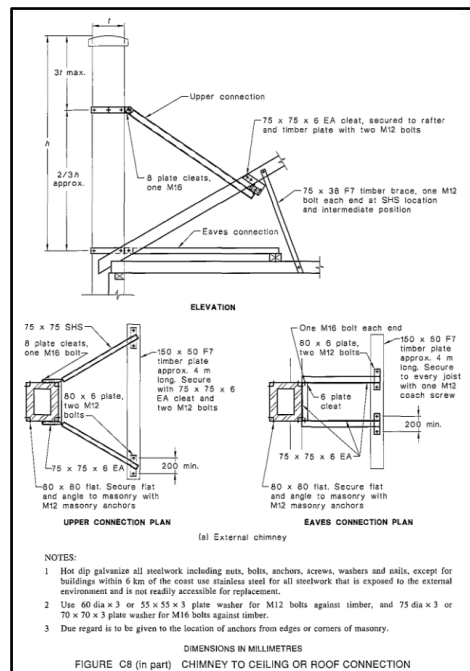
Extract of AS3826 chimney to ceiling or roof connection
